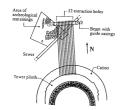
Preliminary underexcavation experiment beneath the tower: layout in plan
